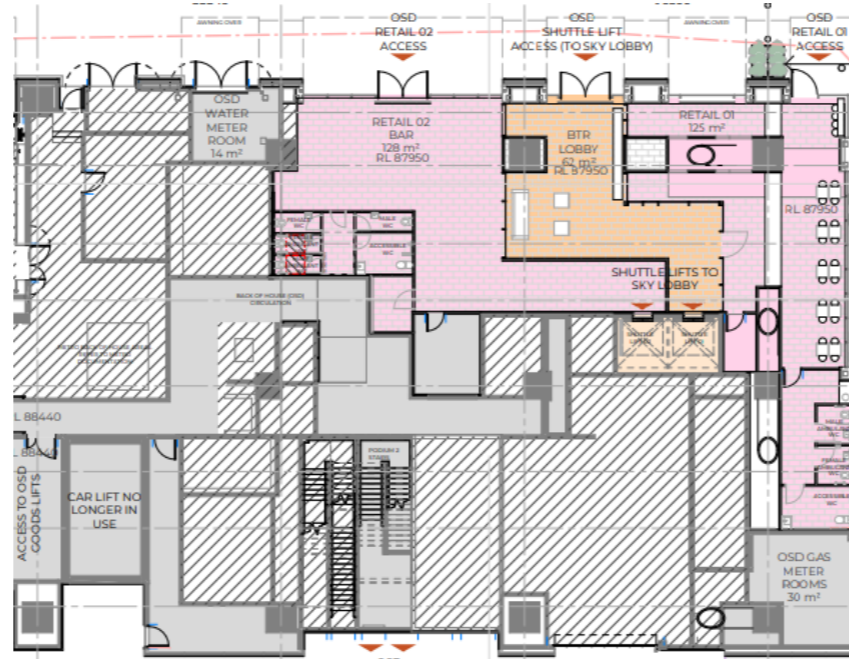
Proposed Licensed Premises lower ground floor. Source: Woods Bagot
